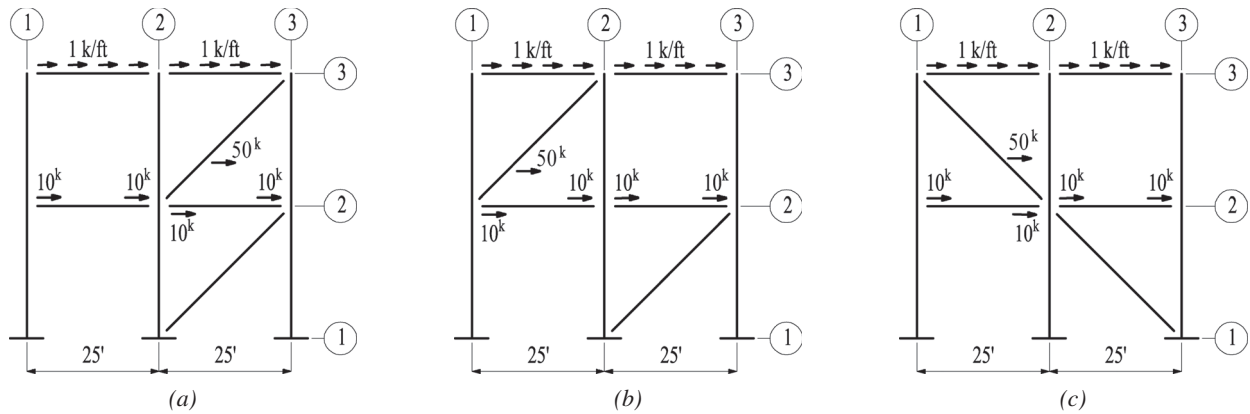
Forces entering beams from diaphragm and horizontal bracing. (a) Bracing arrangement 1. (b) Bracing arrangement 2. (c) Bracing arrangement 3.
